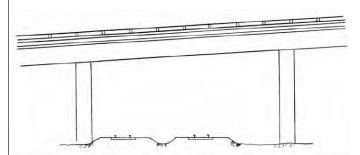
Bridge elevation view with two freight/passenger rail tracks below the bridge.
